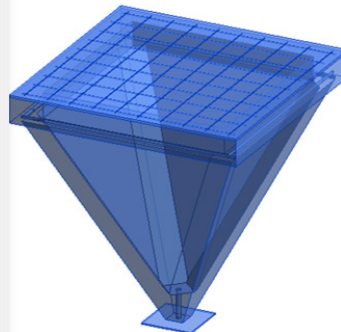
Layout plan of pyramidal elements of a hybrid structural coating based on steel fiber concrete in axes 1-2/AB
